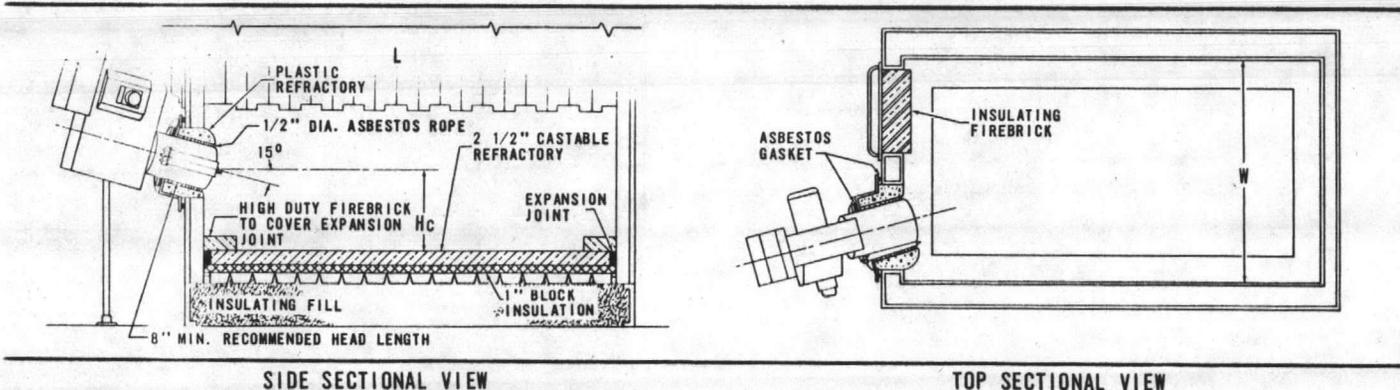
TYPE "R" BURNER INSTALLATION FIRING CAST IRON BOILER WITH DOUBLE DOORS
